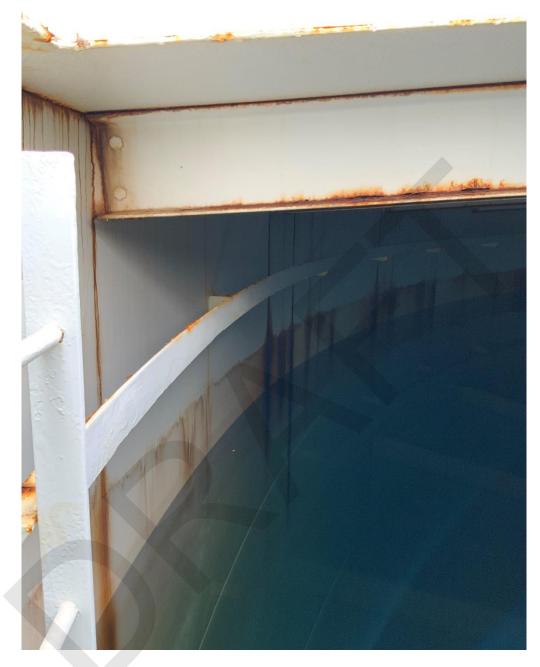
Tank Interior Roof Framing Corrosion
